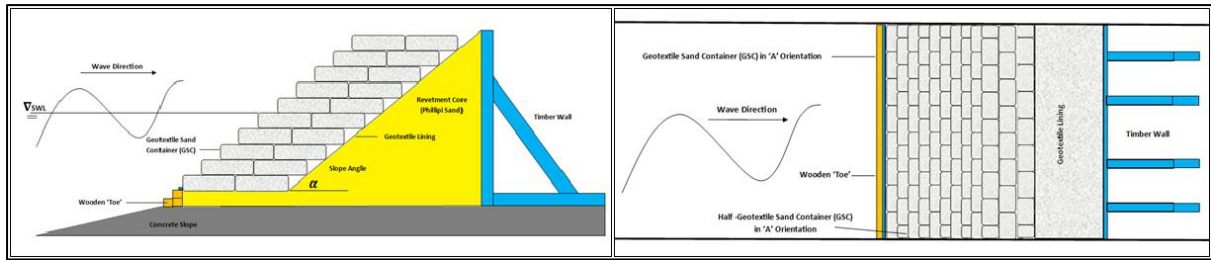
Schematic Cross-section (Left) and Plan View (Right) of GSC Revetment for Test Series 11
